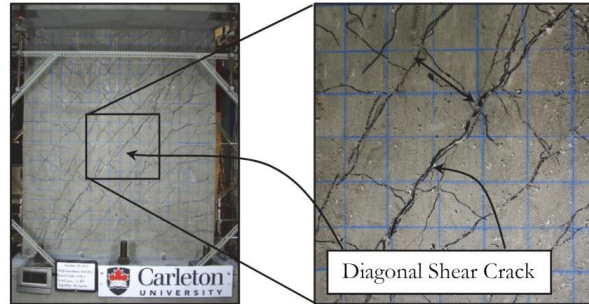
Large diagonal shear crack indicating the brittle shear failure of the unstrengthened shear wall (Woods, 2014)
